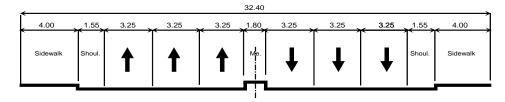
Typical Cross Section of Existing Roads in DCC
